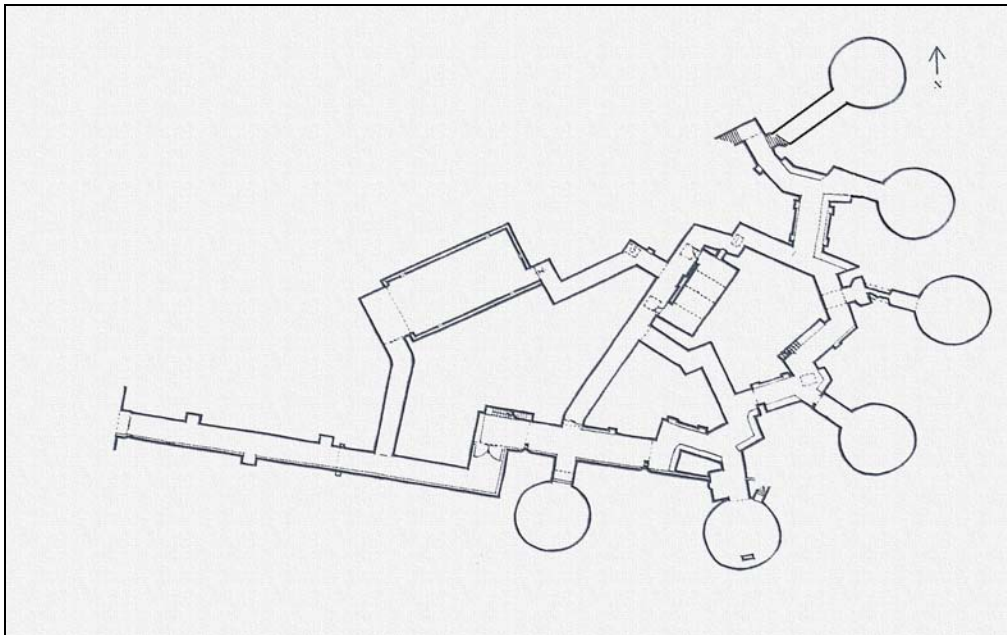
Plan of the Georges Head Battery (A84), showing open gun pits, zig-zag trenches and tunnels, and underground chambers. In 1888 part of the battery was converted to a firing and observations post for the new torpedo or submarine mines that were laid across the harbour. The two northern-most gun pits and trenches are currently filled while the tunnel leading to the west connects the battery with the Gunners' Barracks.
